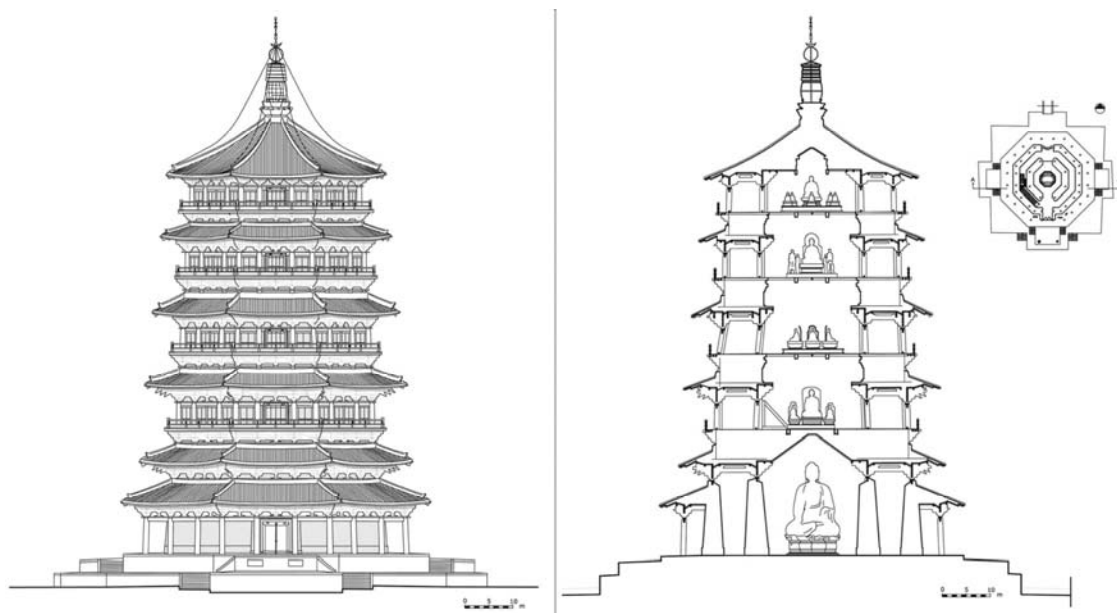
South elevation and Transversal section A-A' Sakyamuni Tower (B. Messeri)
